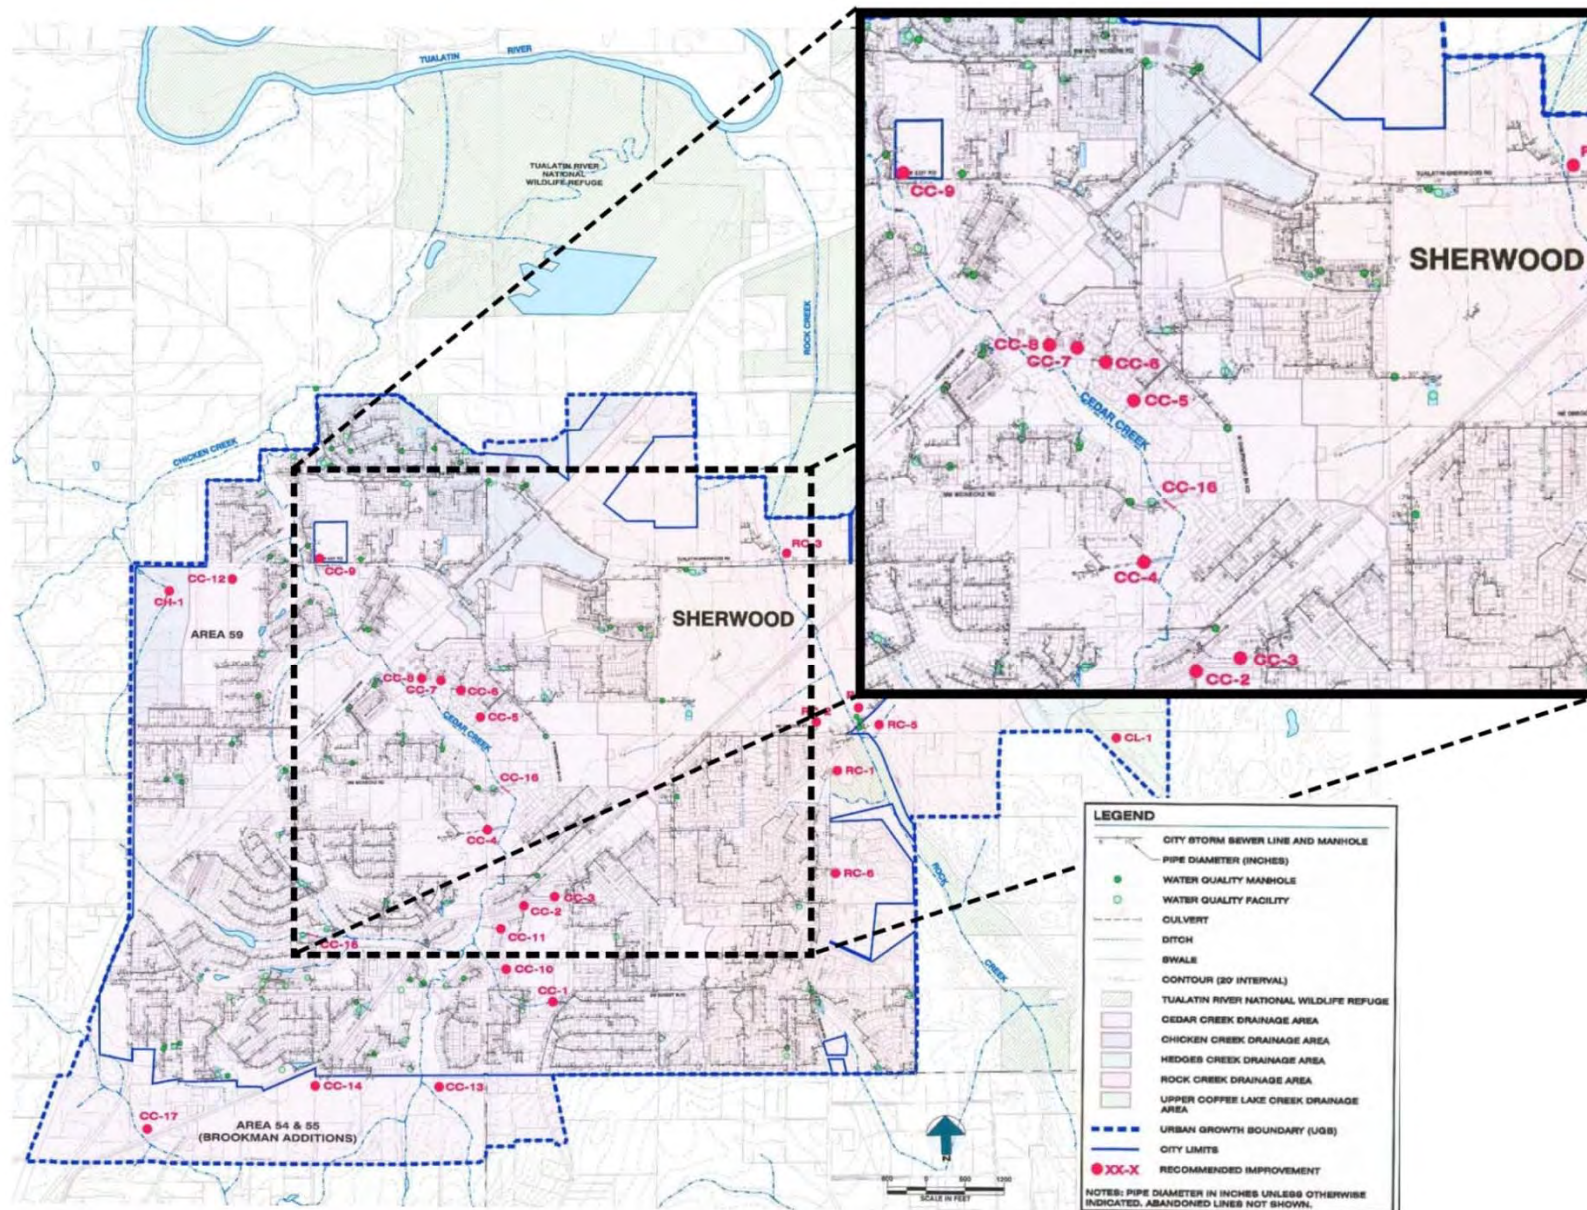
Stormwater Master Plan, Proposed Improvements Map
